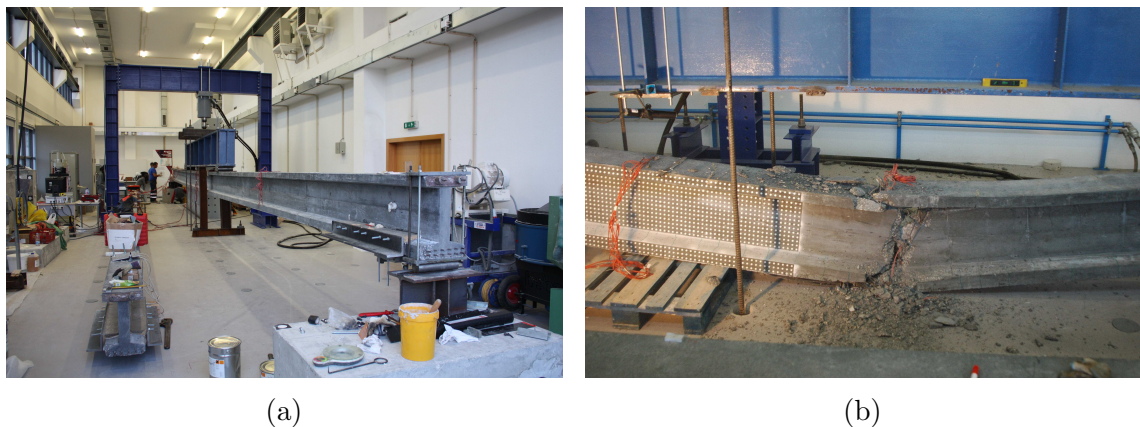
Experimental test of CFRP strengthened HSC girder: (a) test set-up; and (b) failure.
